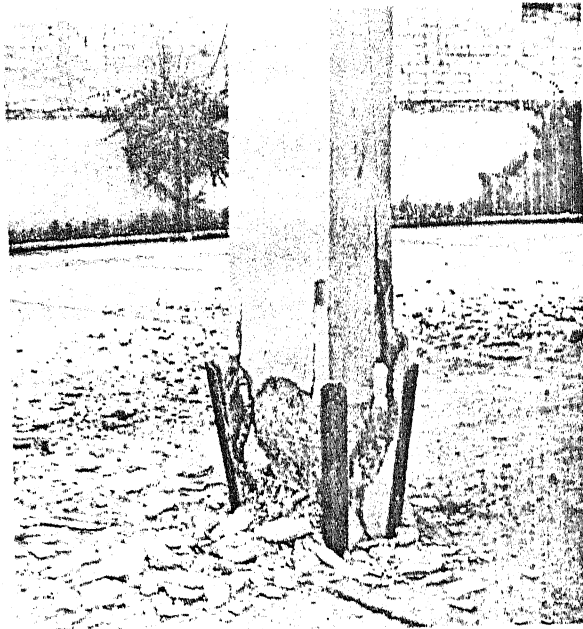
San Bosco building. Damaged column at ground level. Compression failure.
